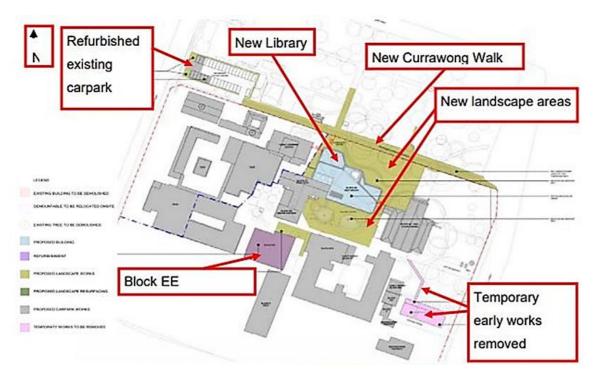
Proposed site layout (Young High School Library and Joint Community Facility EIS, 2019)
